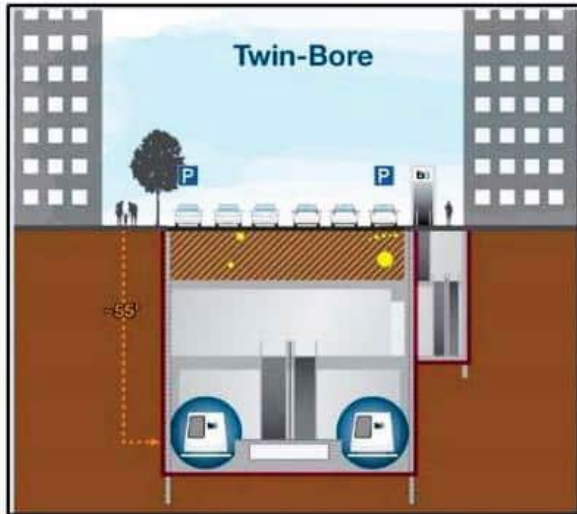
Example of single-bored and twin-bored tunnels [W-25]
